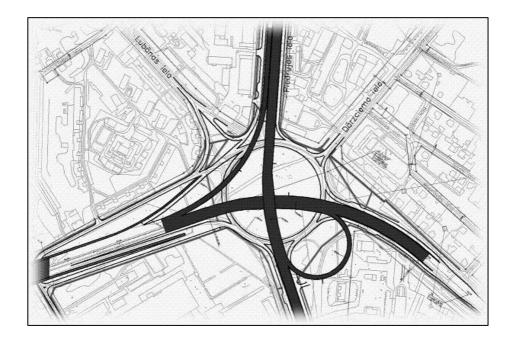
Riga, Latvia Southern Bridge Plan http://www.rdpad.lv/uploads/dienvidu%20tilts/pic%20(5).jpg
